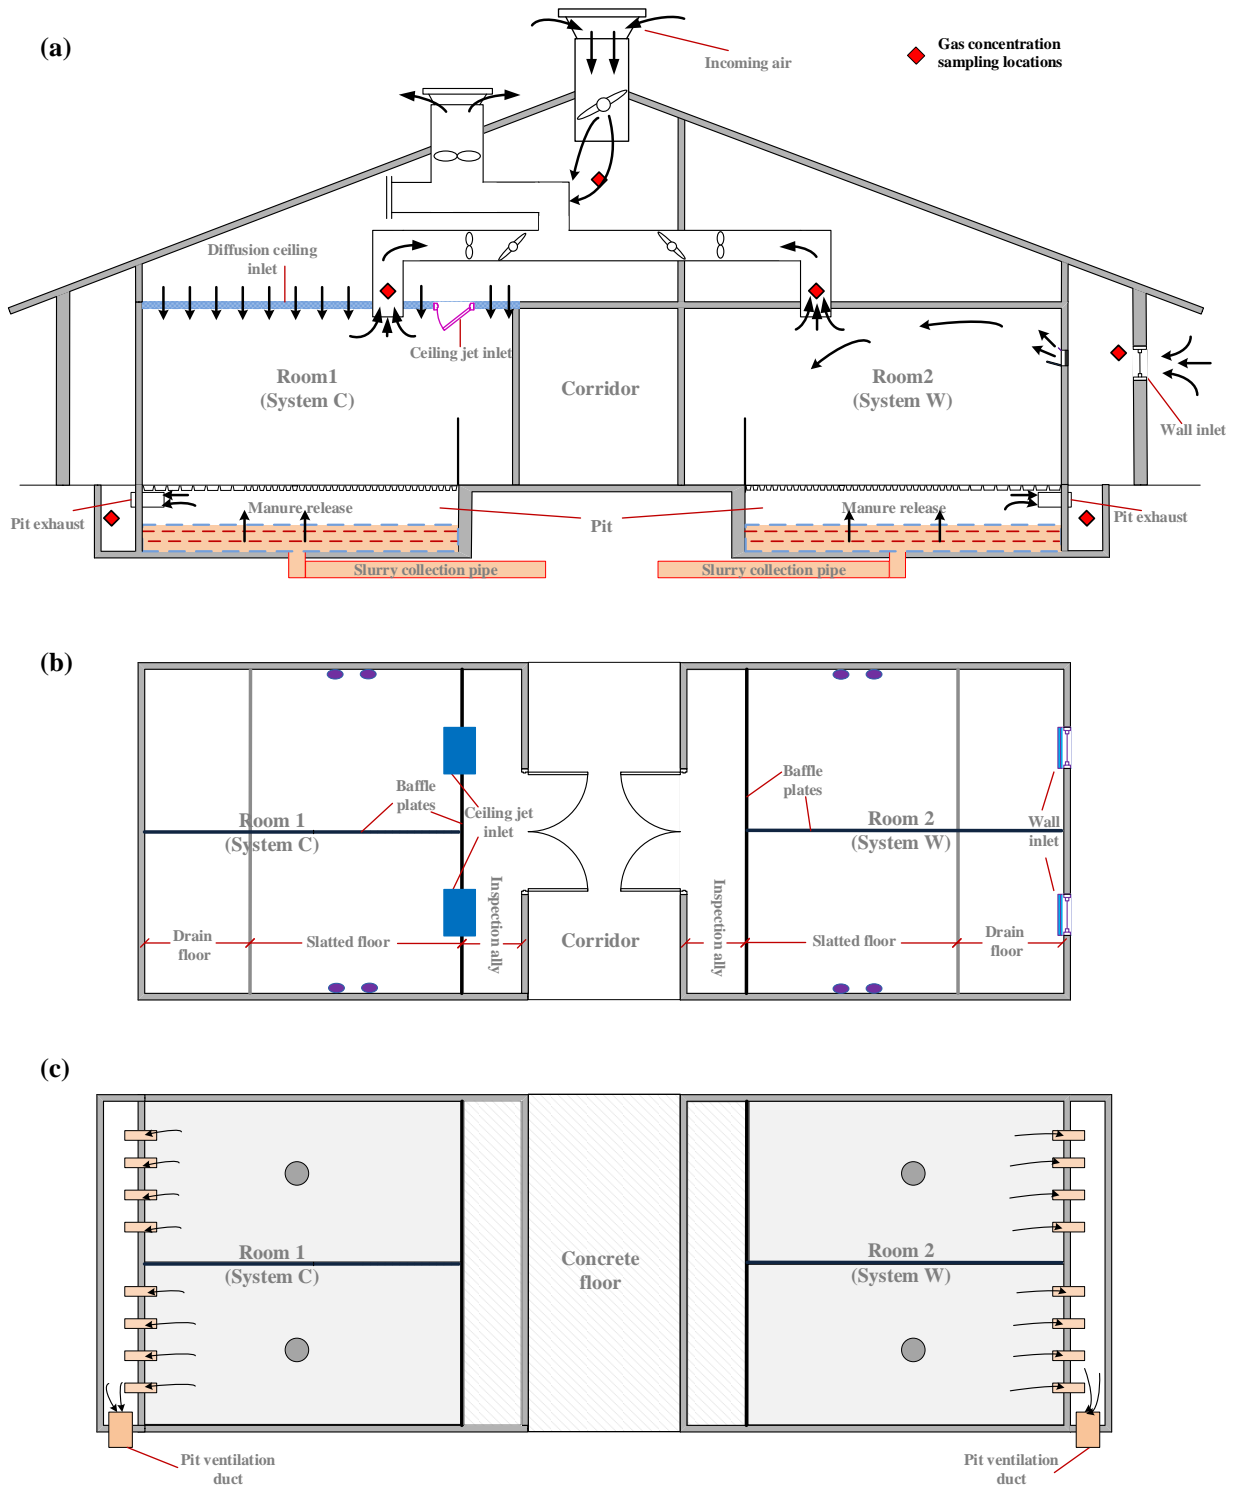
(a) cross-section and (b) floor plan of the experimental rooms; (c) pit ventilation system under the floor.
